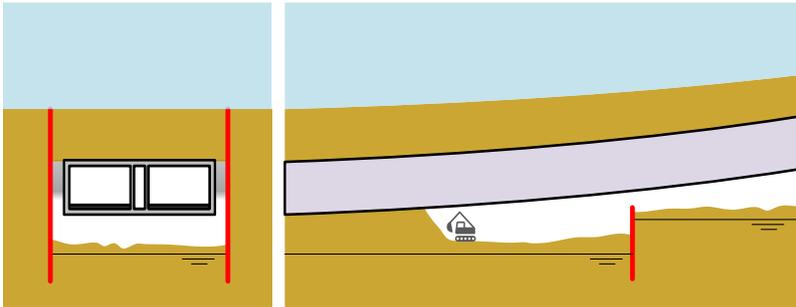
, LOWERING TUNNEL BY DIGGING; SIDE VIEWS
